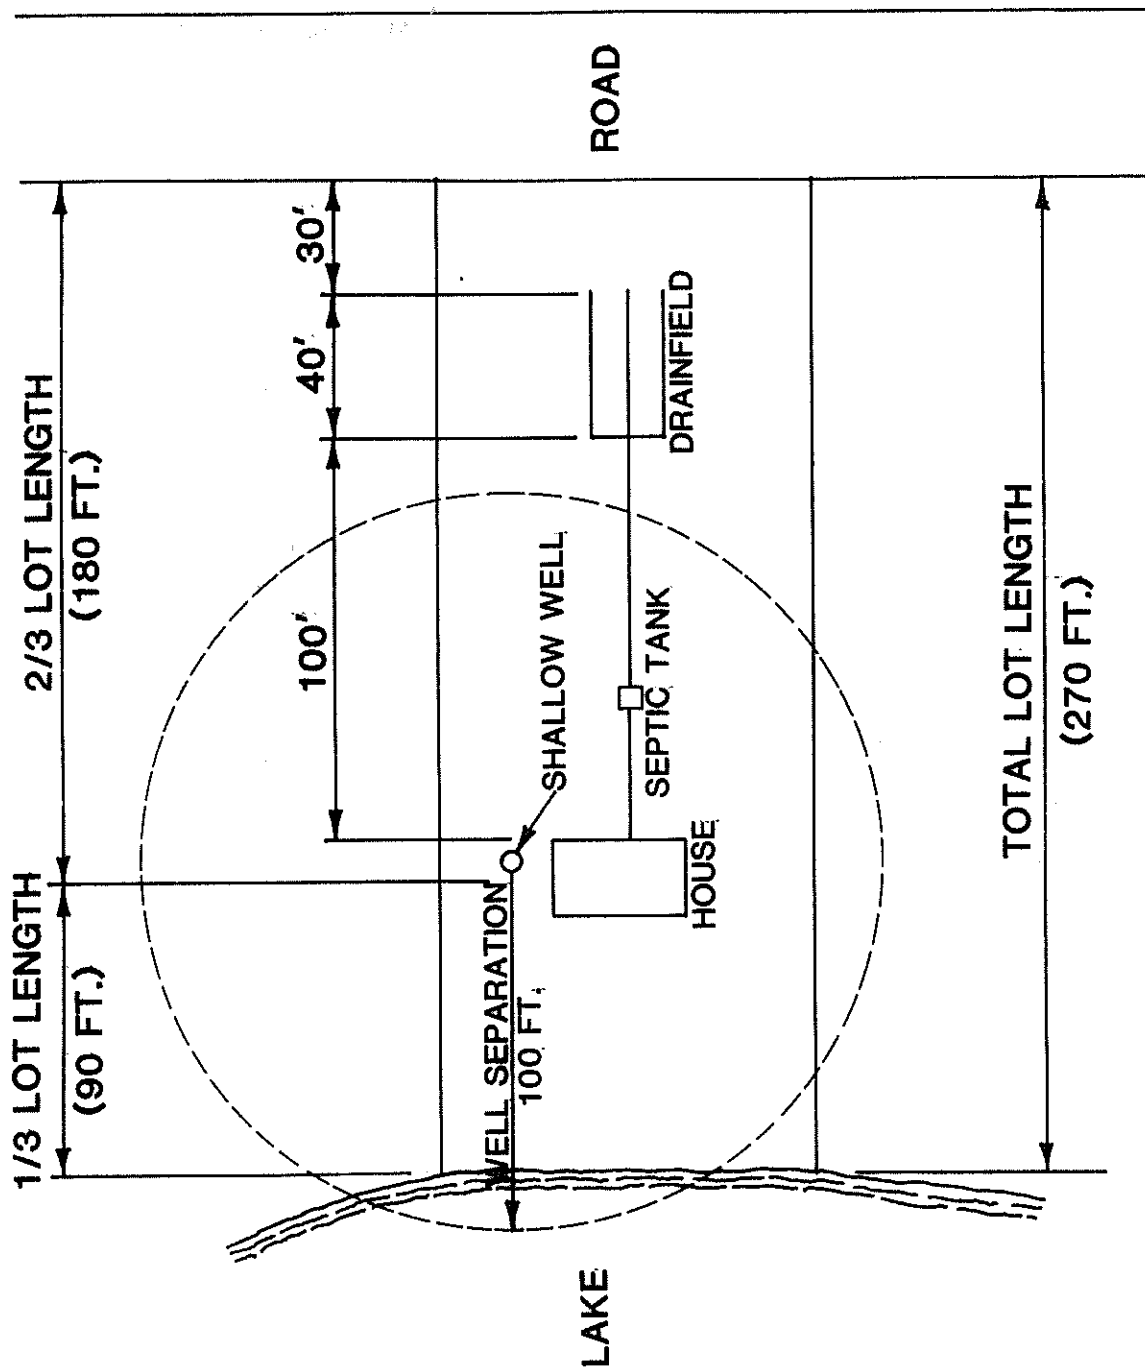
Typical minimum lot size required to meet separation distance for shallow well with house off-set from center of lot.
